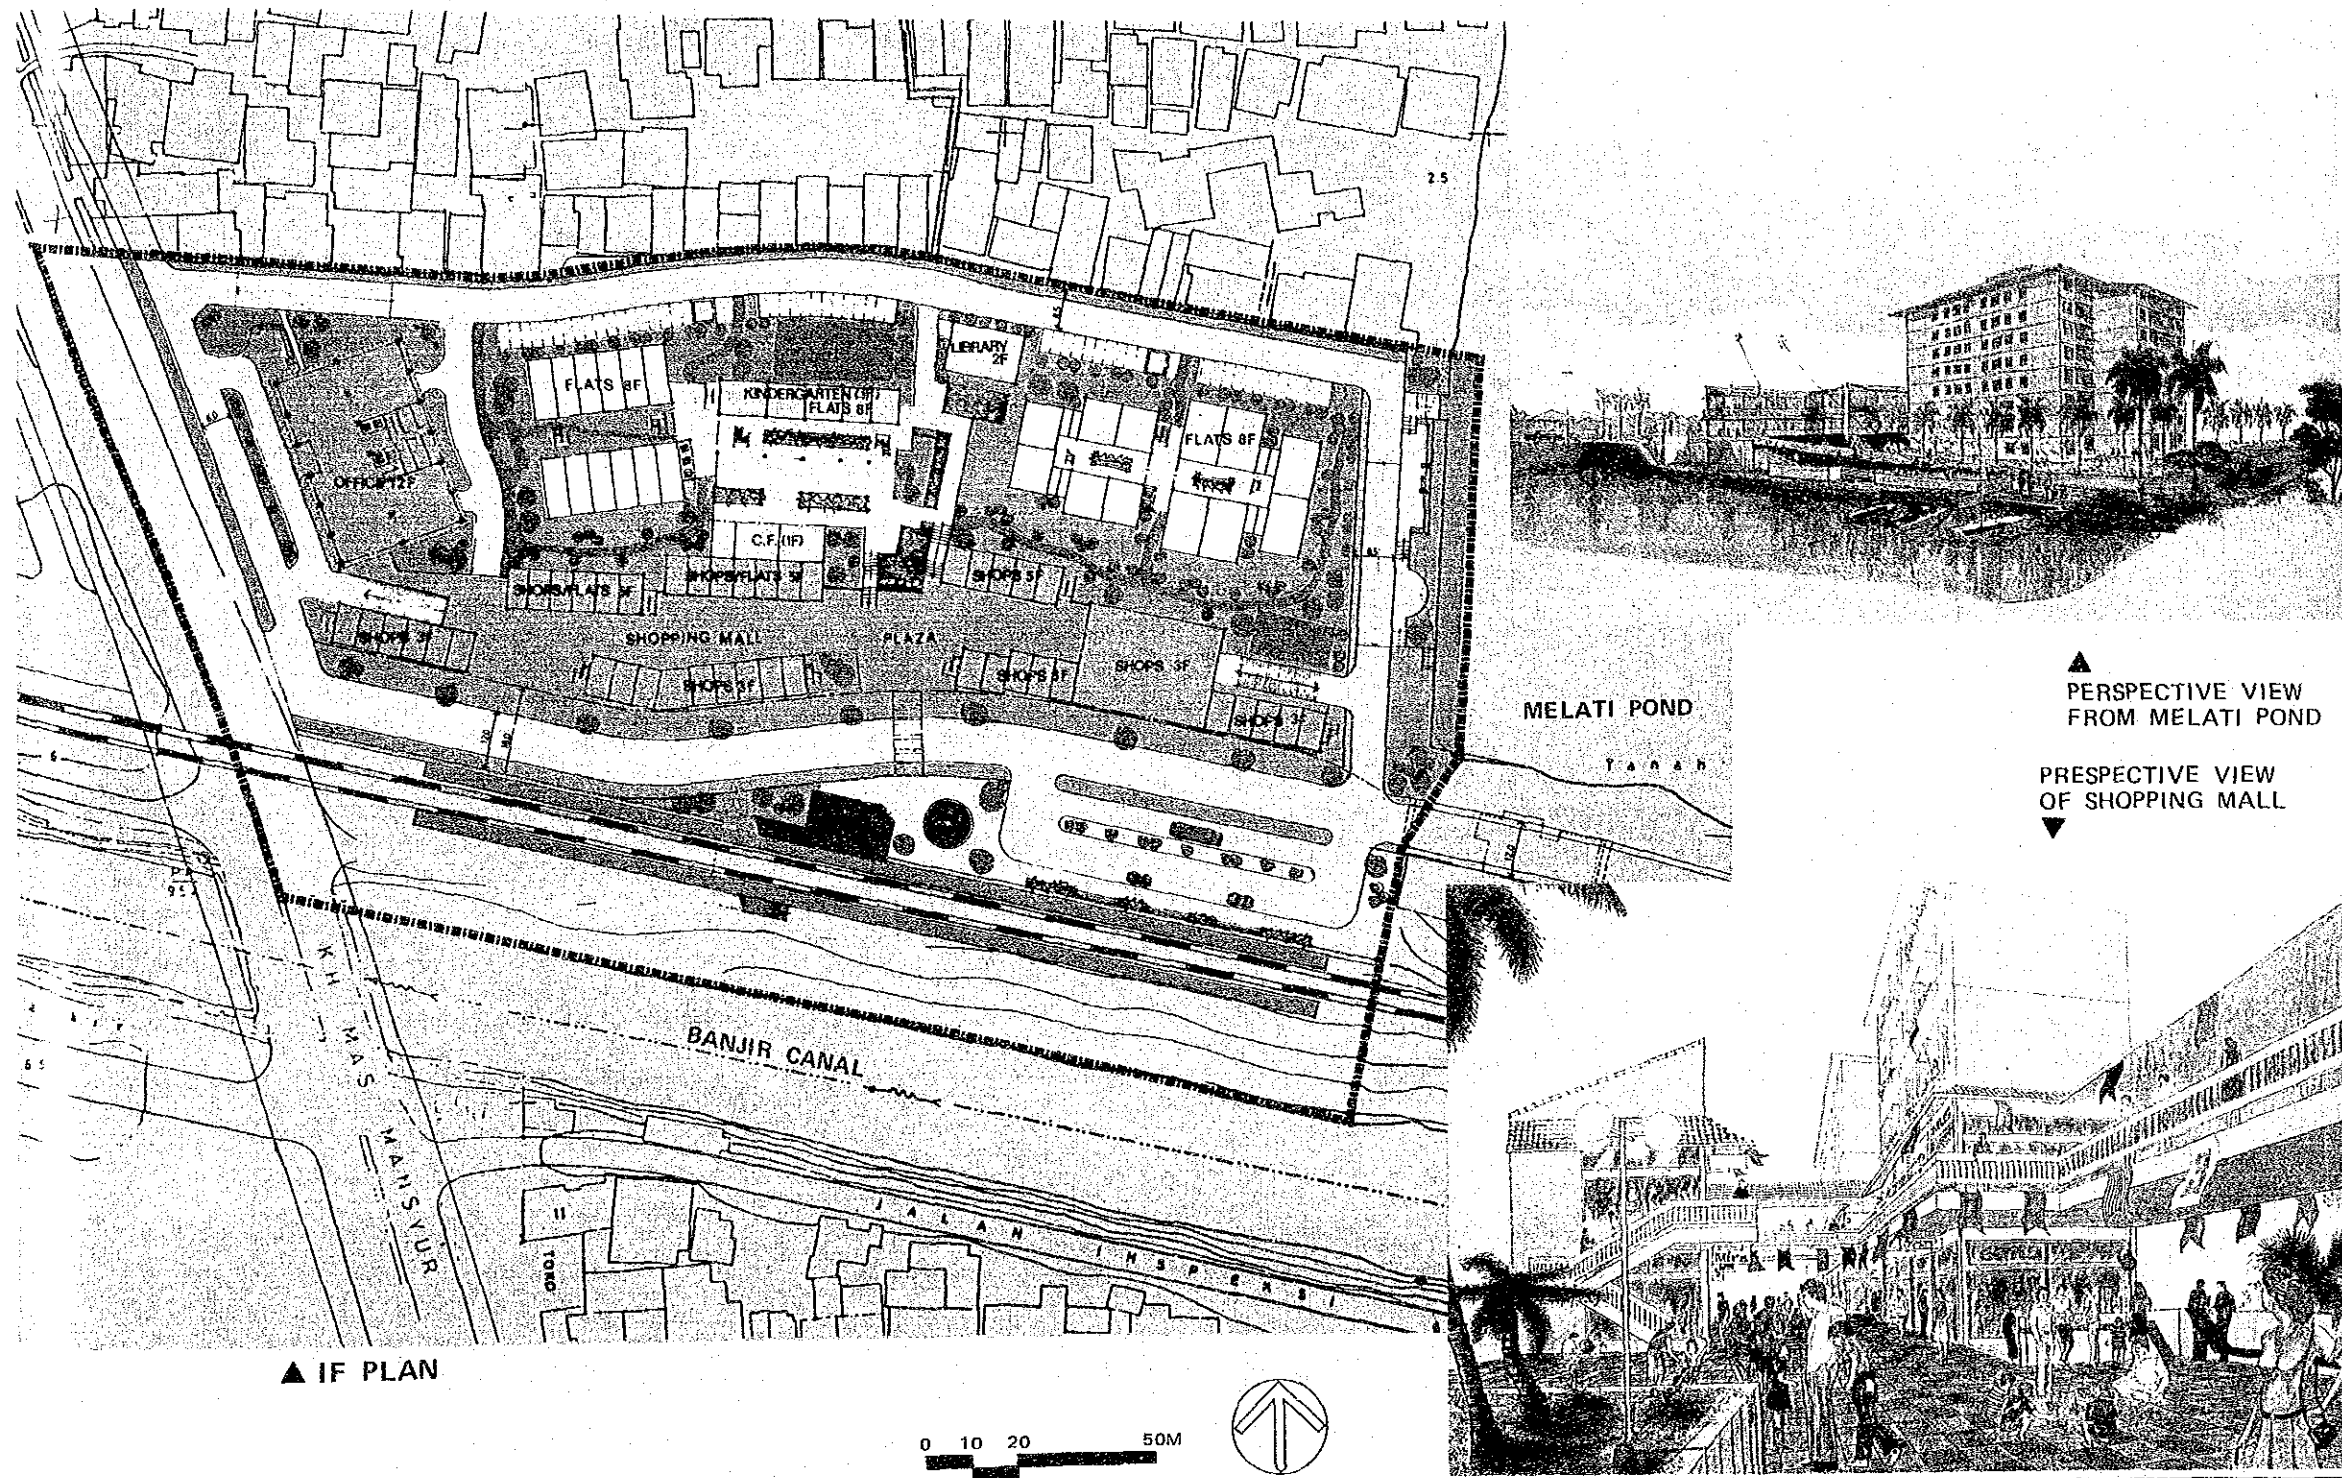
LAYOUT PLANNING - KEBON MELATI
